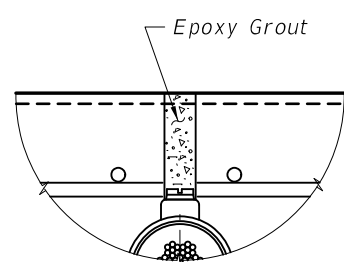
DETAIL A - FACE INSPECTED ANCHOR WITH GROUT OUTLET
